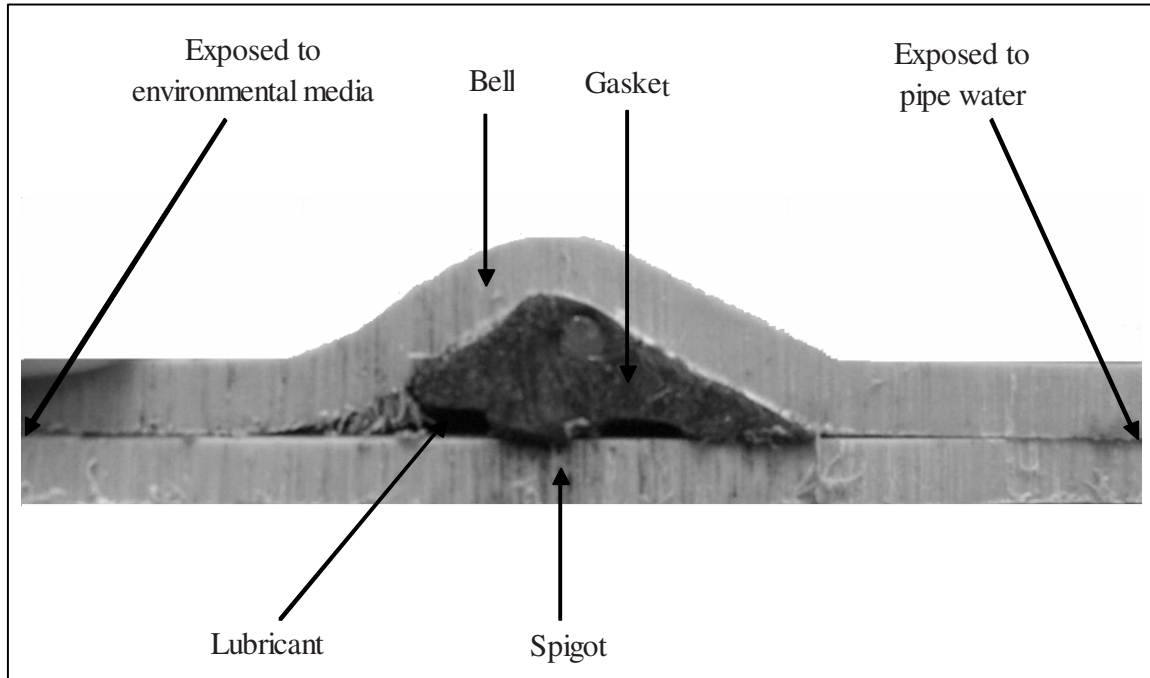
Cross section of PVC pipe joint with SBR Rieber gasket
